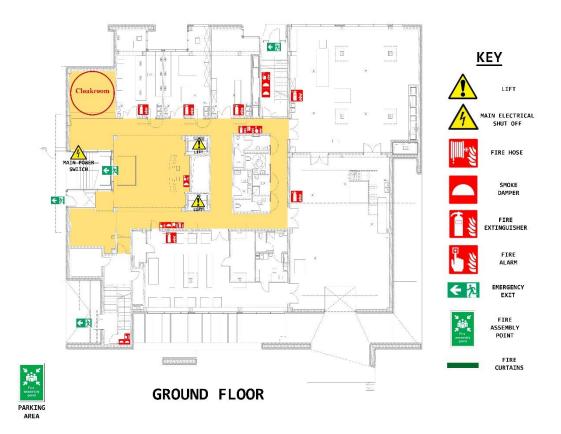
LabFactor's ground floor plan with the cloakroom represented
